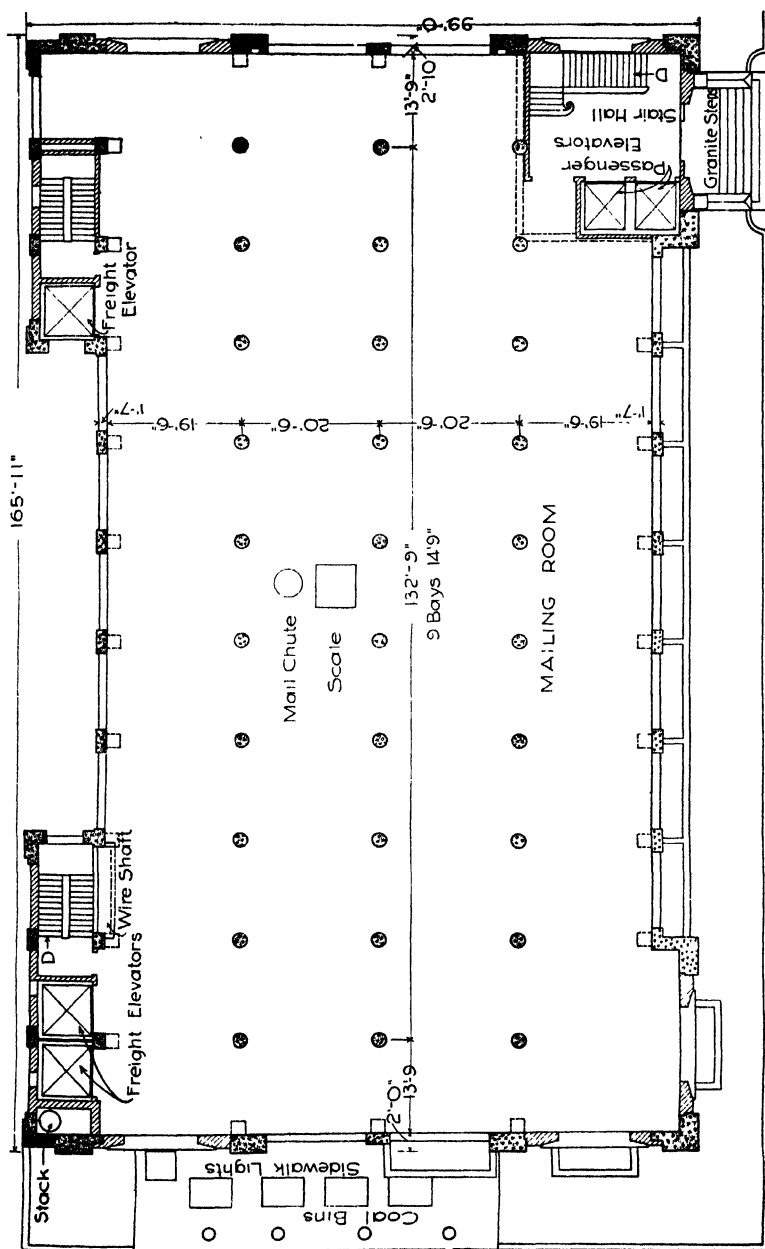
Typical Floor Plan. Youth's Companion Building, Boston, Mass. (See p. 616.)
